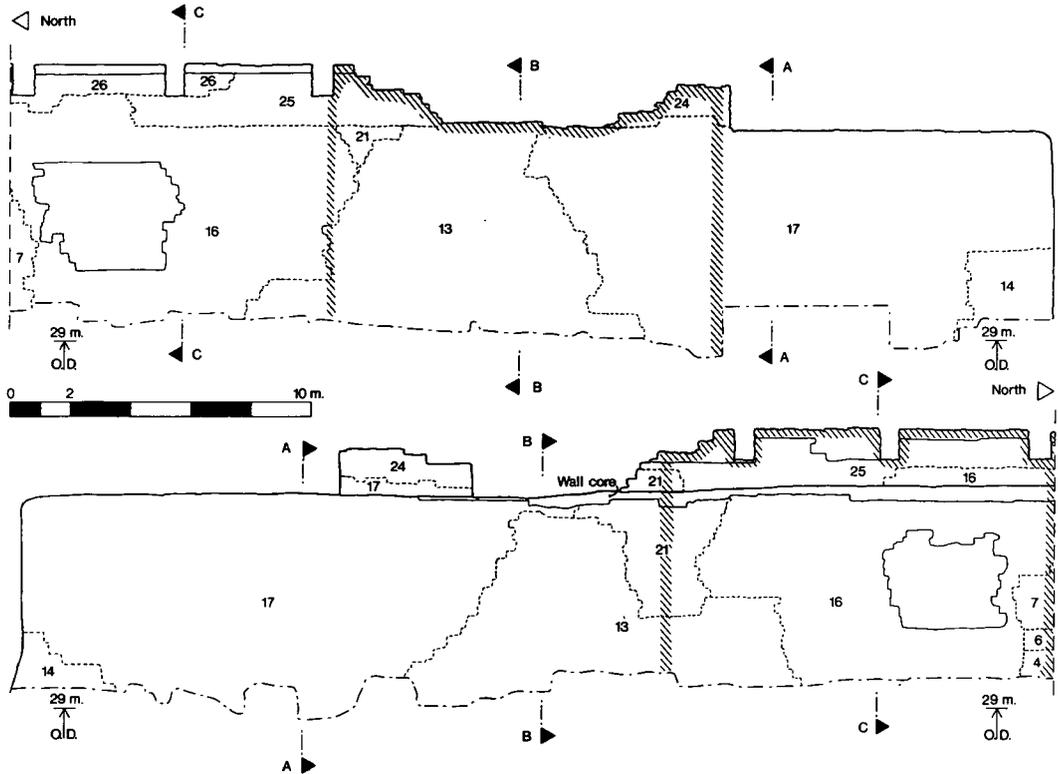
Town Wall, Orchard Street: phased elevation section 4-5.
